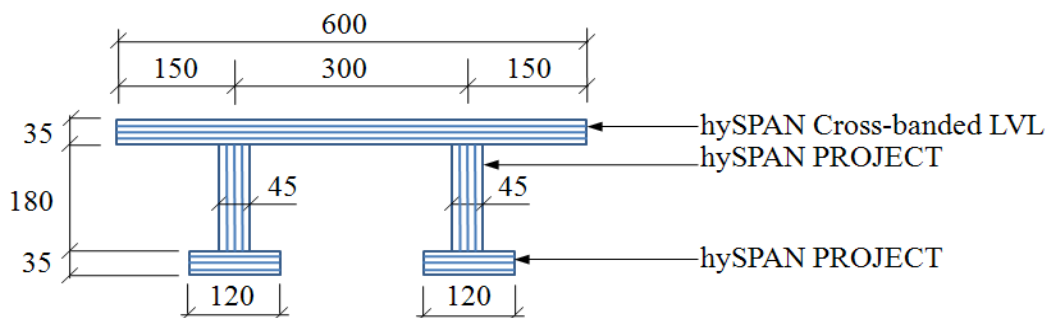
Dimensions of the 6 m span timber beams (mm).
